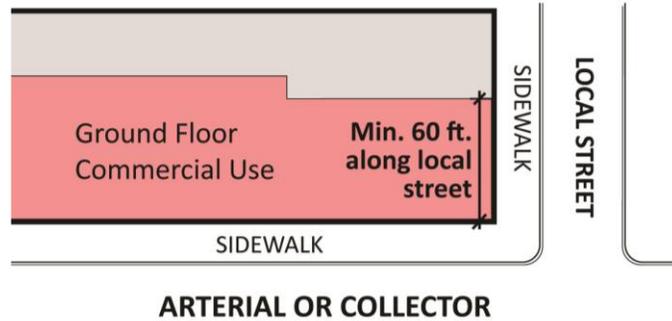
Minimum Commercial Depth along a Local Street
